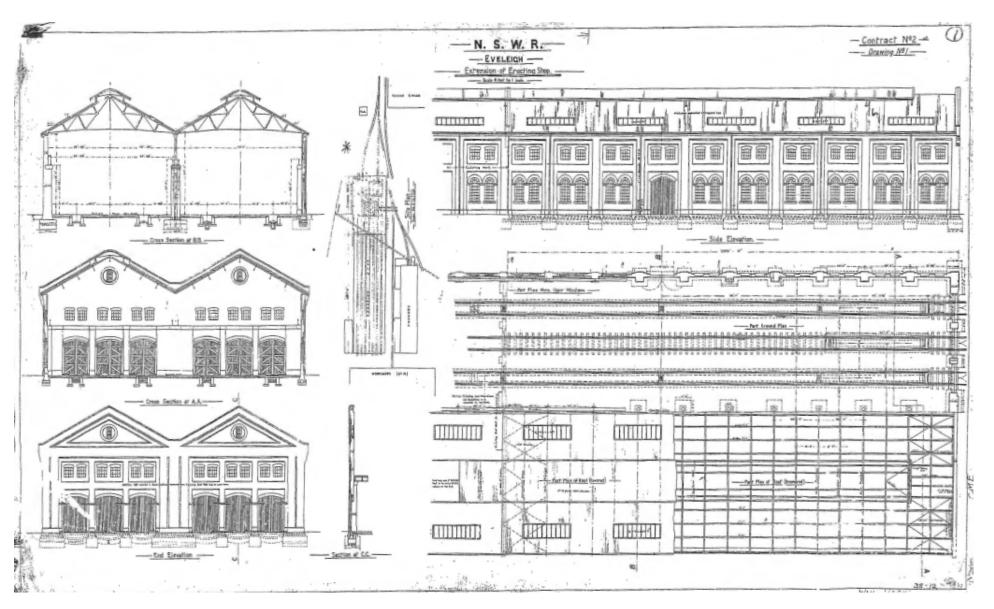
Drawings for the LES Building (formerly known as Erecting Shop), undated. Source: State Rail Authority, NSW State Archives, NRS-20550-2-24-COR/529P2, 38-12.
